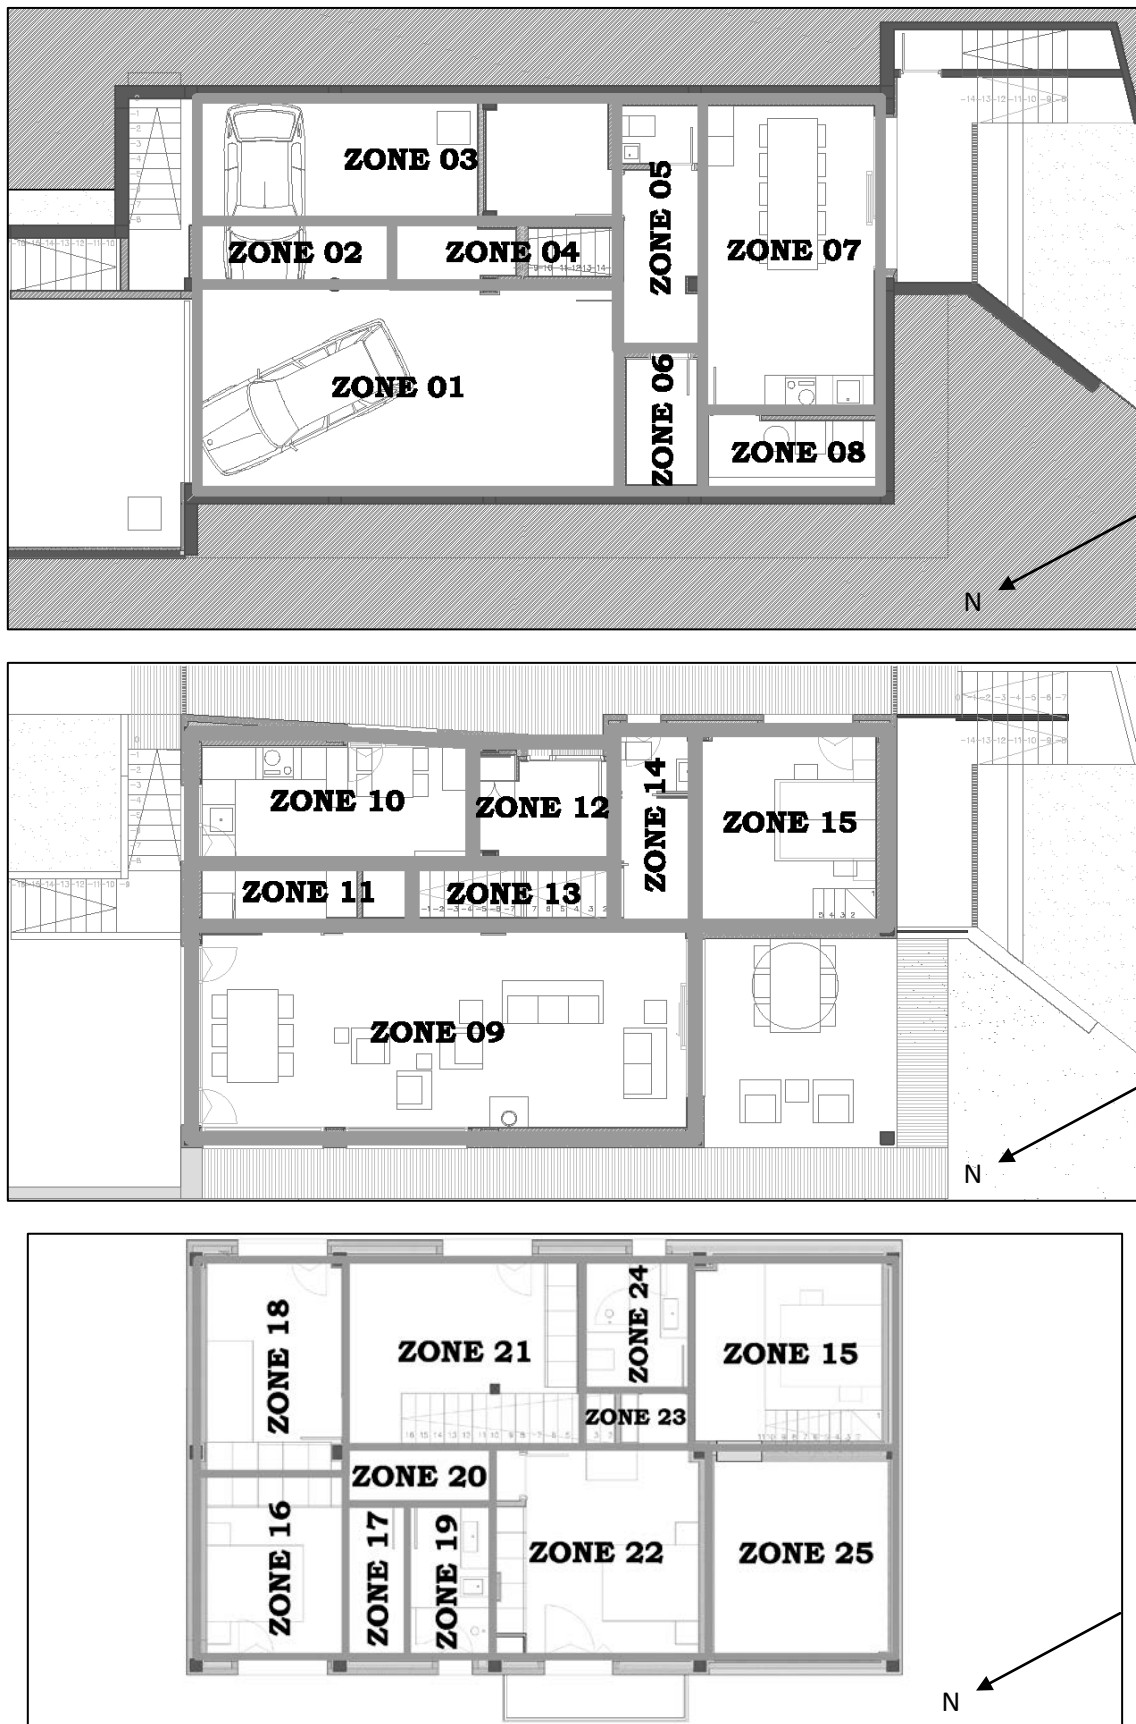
Plan of the dwelling and its zoning: basement, ground floor and first floor.
